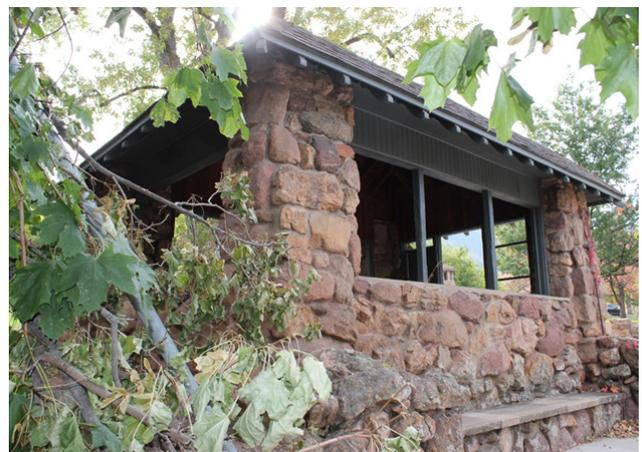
North wall of the Shelter House, 2020 (source: JVA)
